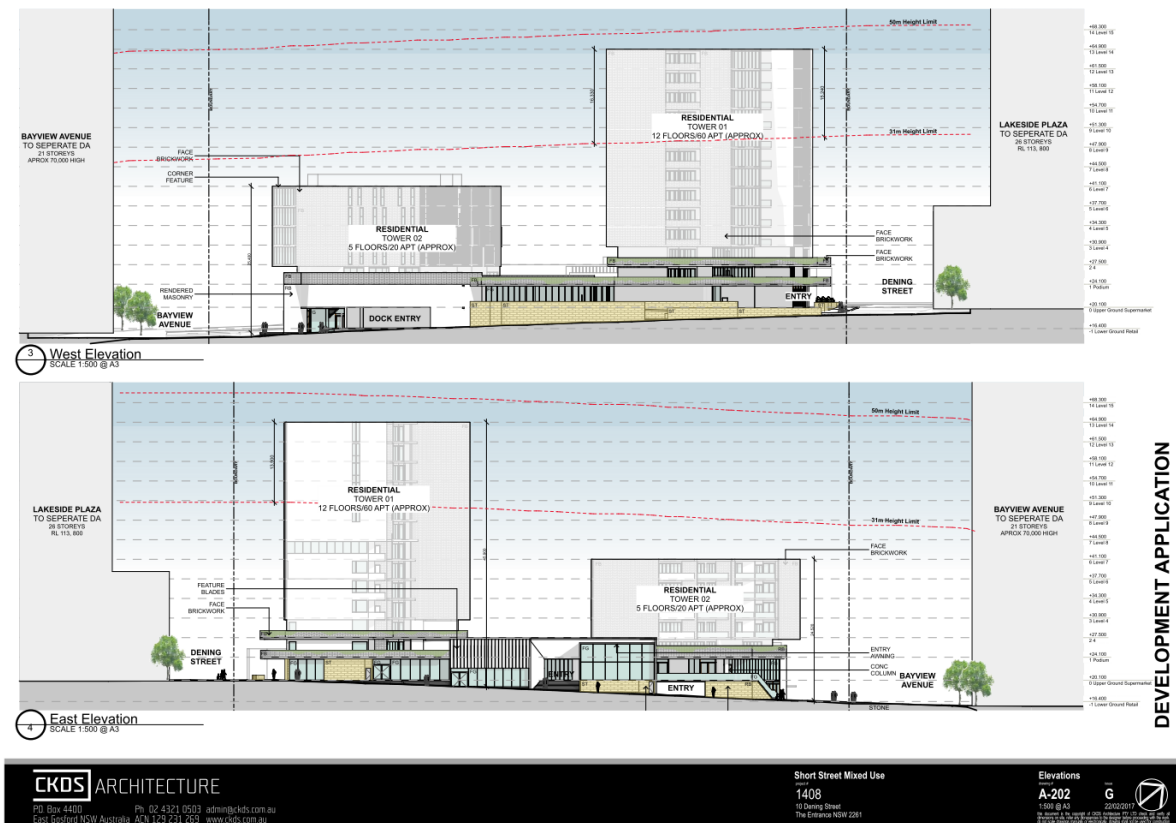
Maximum Height Variation (from East & West Elevation, Tower 1)
